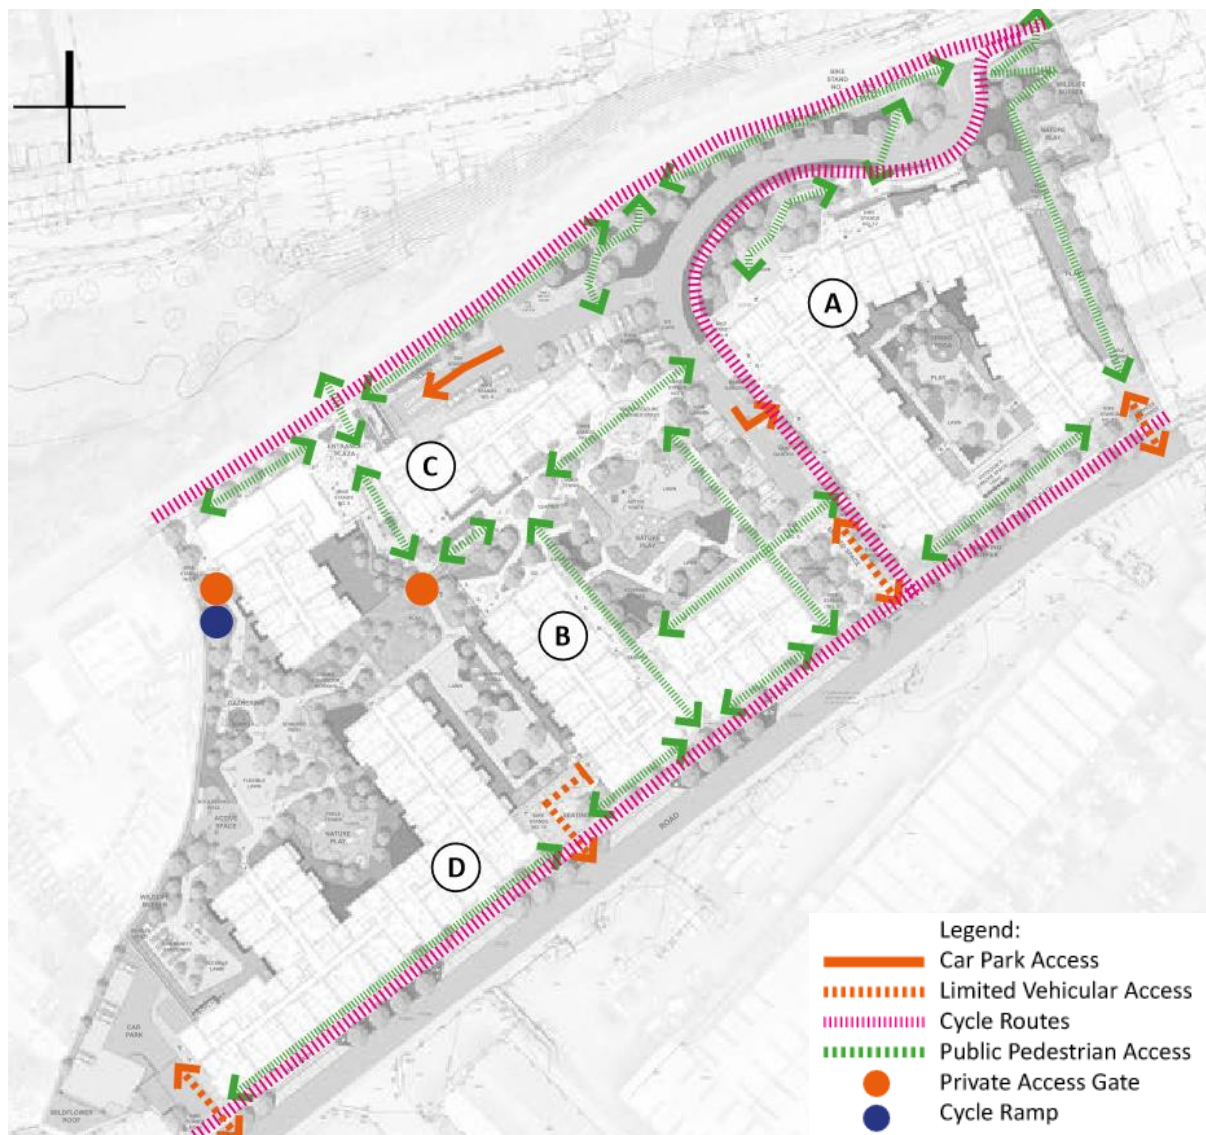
Extract from the Landscape Plan Design Statement showing the accessibility across the site
